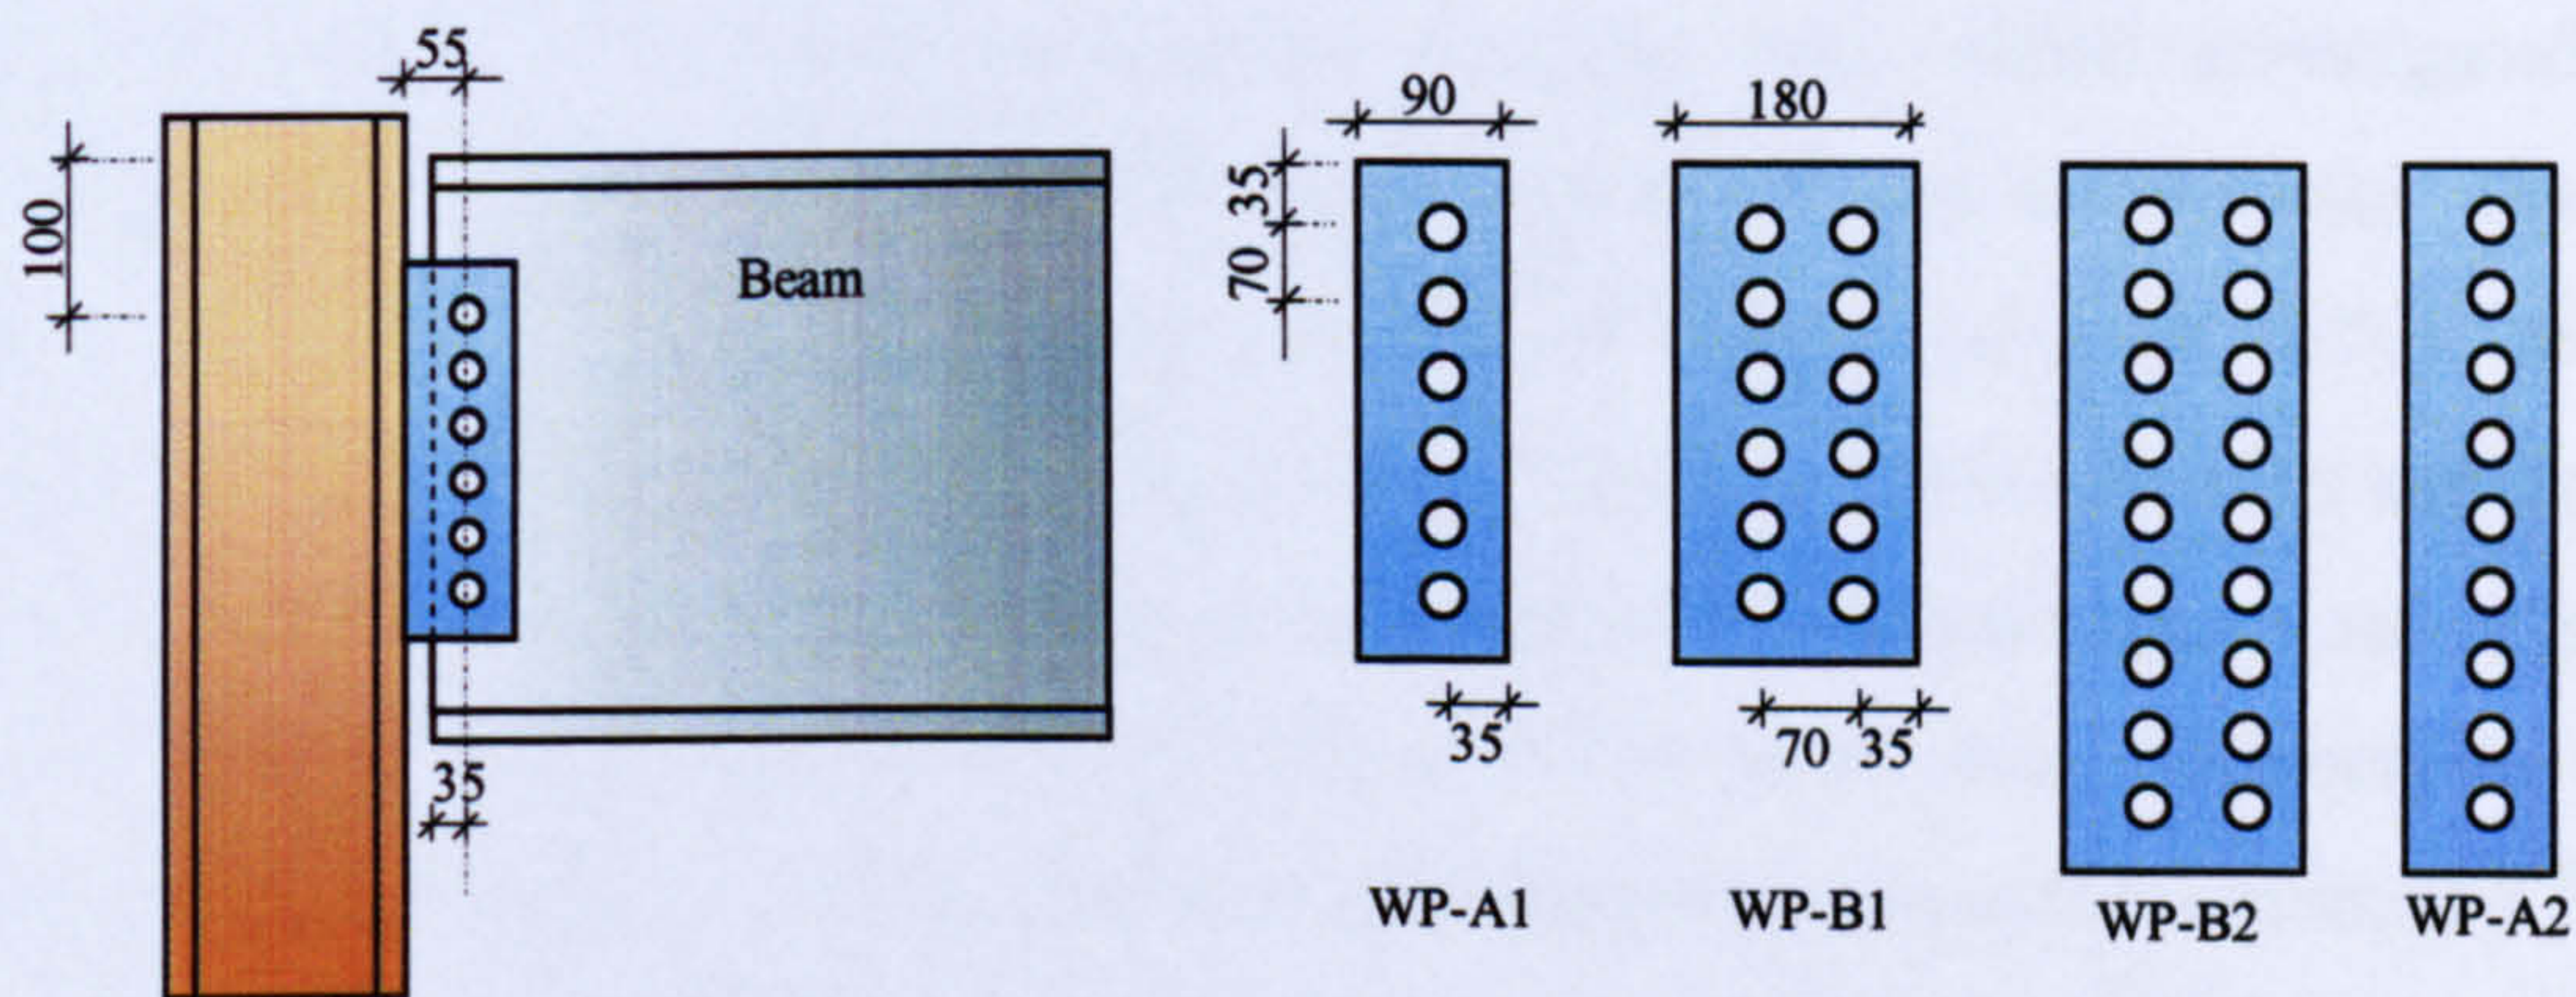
Geometric details of Patrick *et. al.* tests specimens
